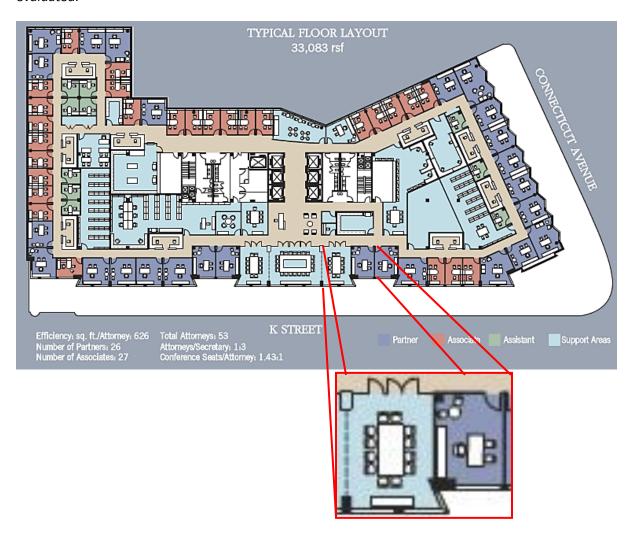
Plan of an attorney's private office (right) and adjacent conference room (left)
